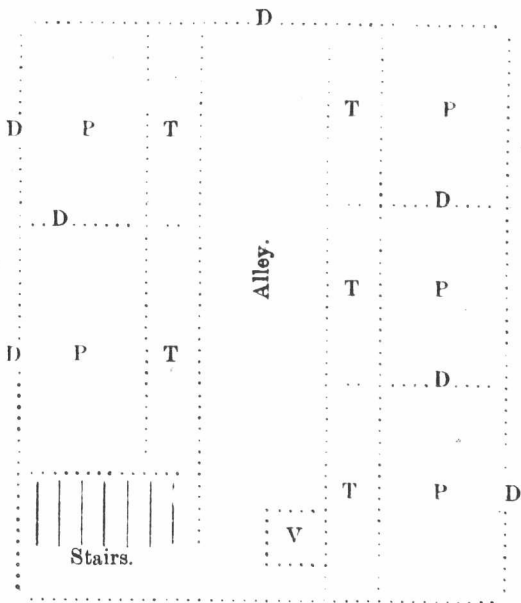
is a plan of the basement, 24-36 feet in area. Through the centre runs a broad alley, with a door at the upper end. In this plan the letters P stand for pens; T for troughs; and D for doors. V represents a swill-vat at the lower end of the alley. The doors in every case are made in two partitions, so that ventilation may be secured by leaving the upper half open while the lower half is shut. The floors and troughs are of stone. A door is hung in front of each trough to push into the pen and fasten over the trough, so as to allow the food to be equally distributed. A pipe leads from a small tub in the story above the swill-vat:
